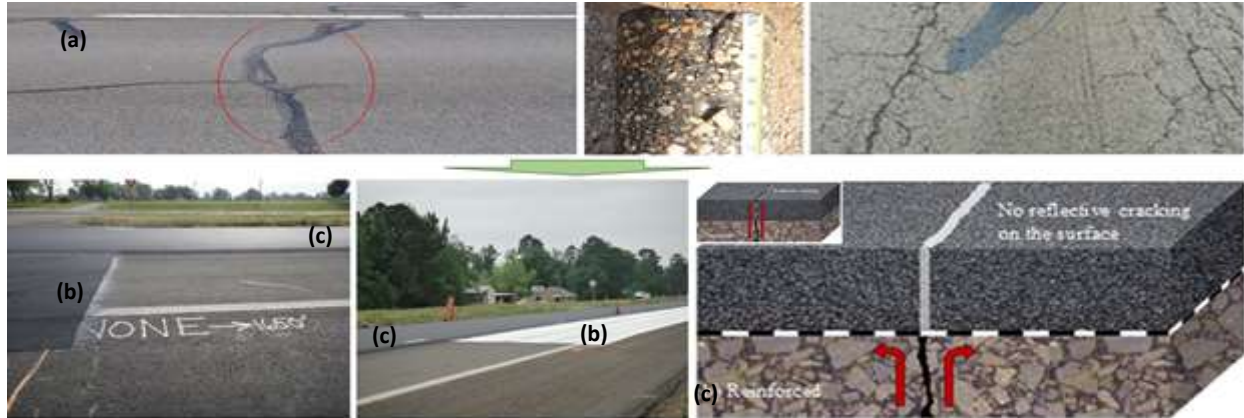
(a) Old Cracked Pavement, (b) Grid-Reinforcement, and (c) Overlay Construction.
